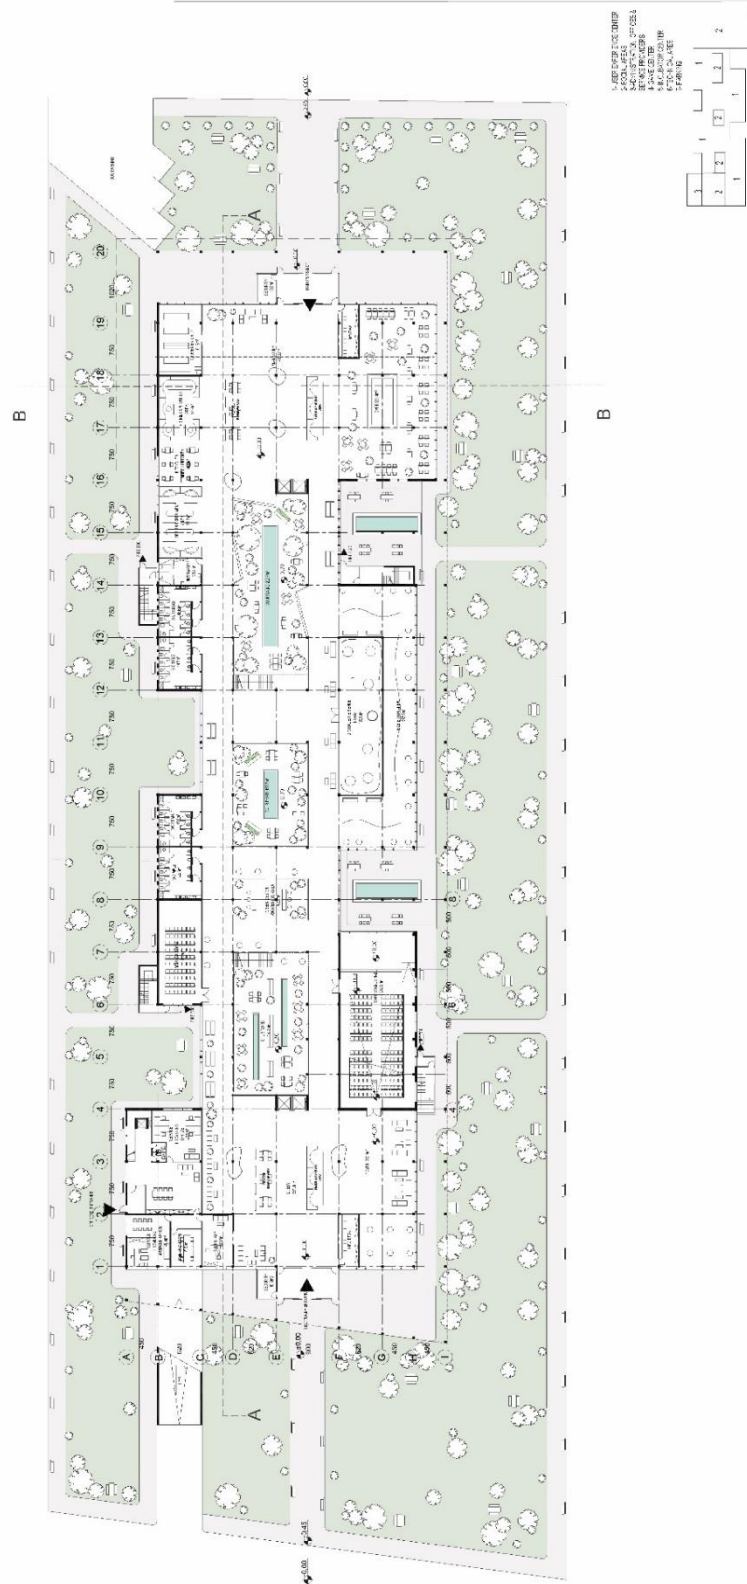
Ground floor plan of Antalya Technology and Innovation Center.
